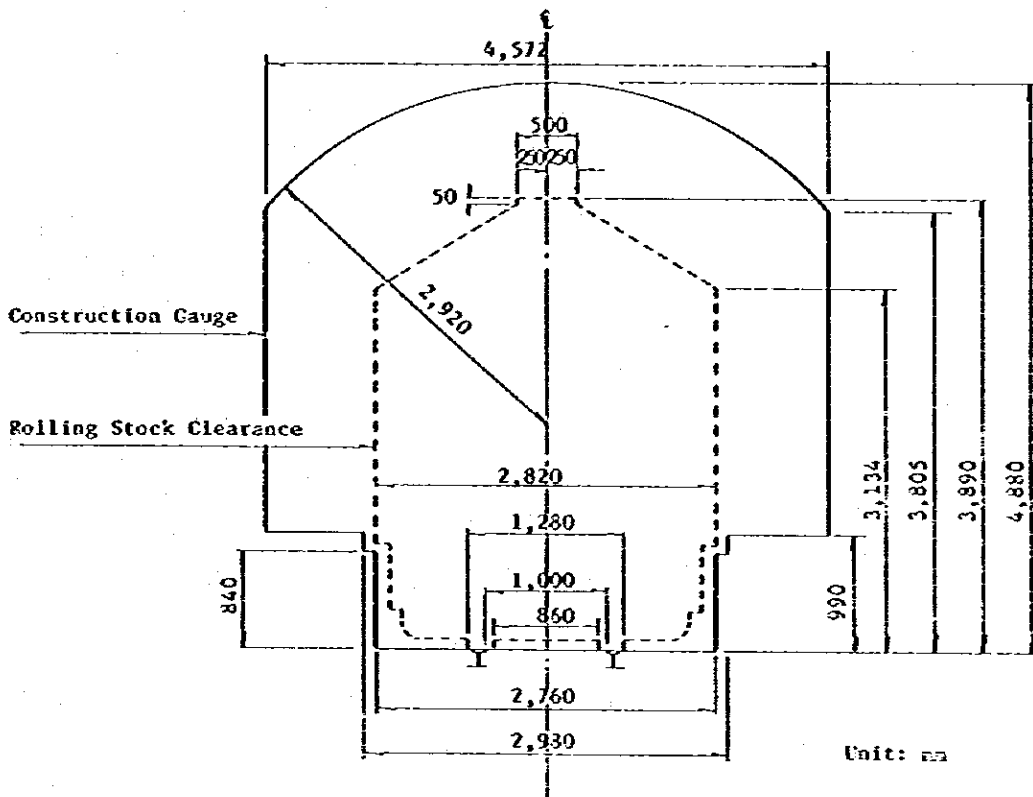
Construction Gauge and Rolling Stock Clearance
